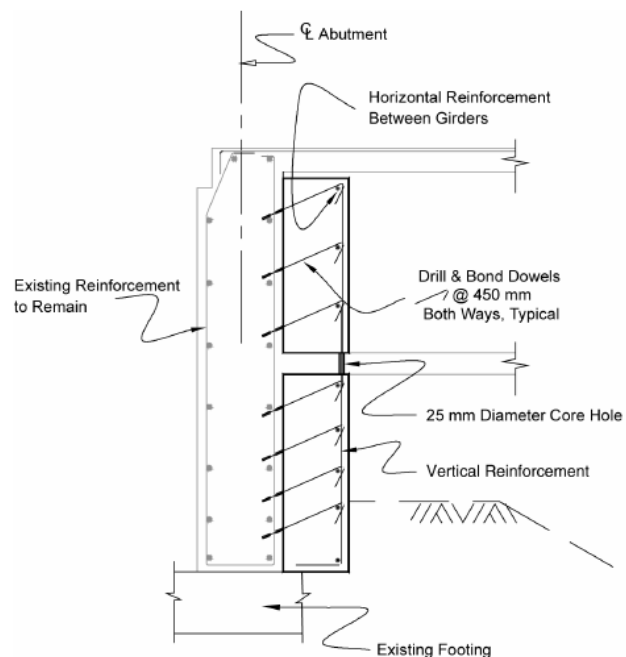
Diaphragm abutment overlay (Adapted from FHWA-SRM, 2005)
